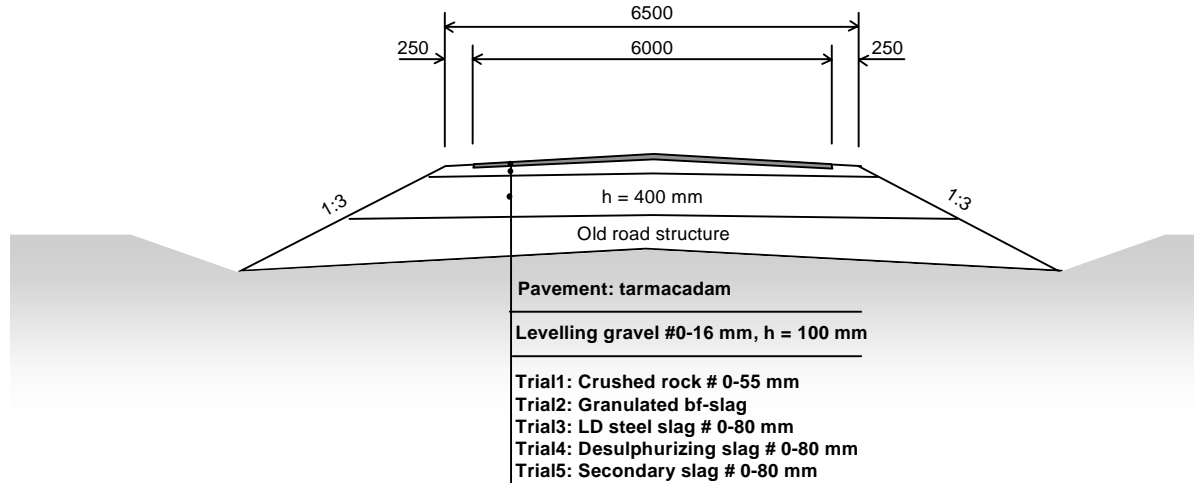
A schematic cross-section of test constructions with massive slag structures.
